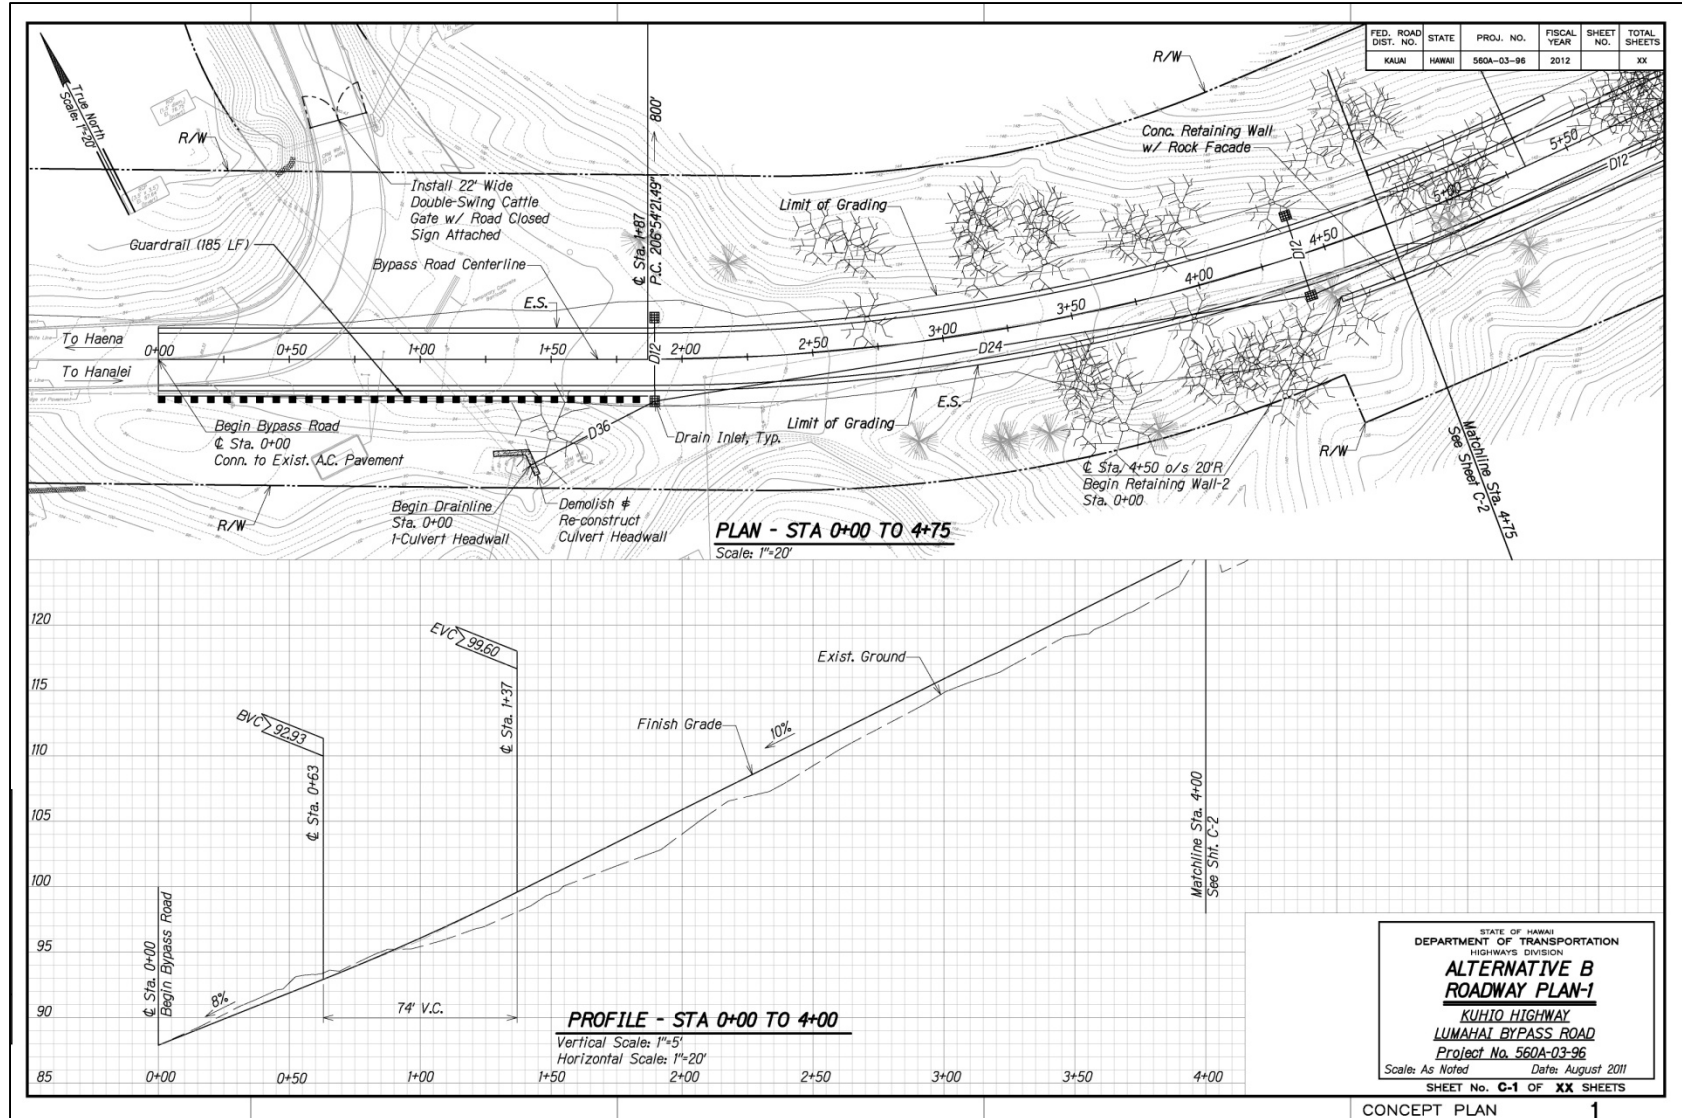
Plan for the proposed Bypass Road Corridor (Plan 1).
